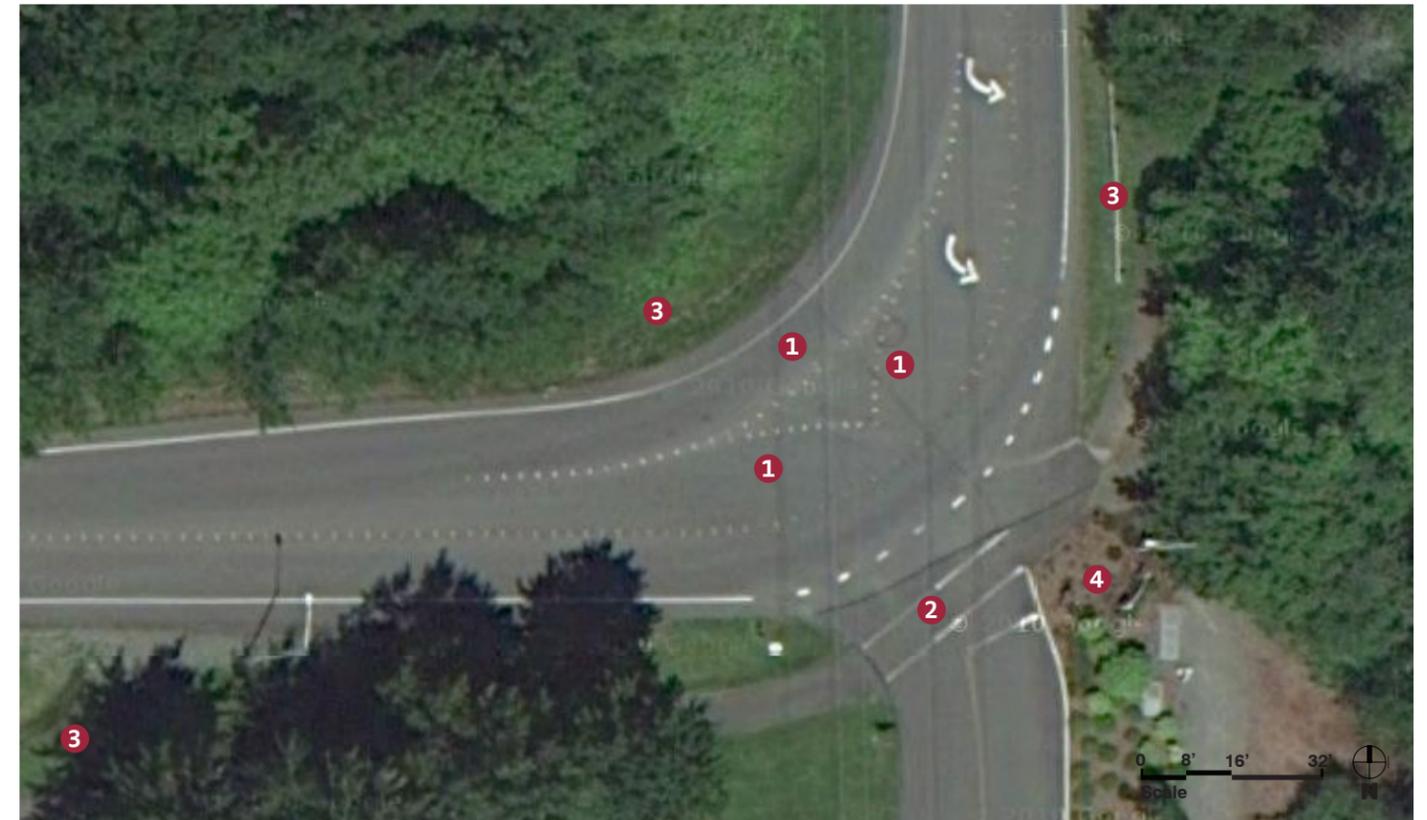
Wilburton Hill Park Entry Existing Conditions Plan
